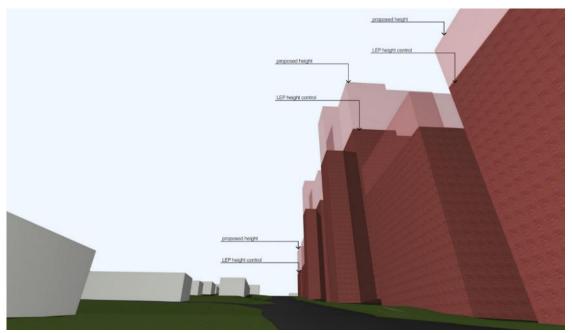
View looking East along Dwyer St of the 2016 Scheme at the Dwyer Street/Mann Street intersection between tower height of RL95.7 (75.7m). The subject proposal is at tower height 72.45m.
